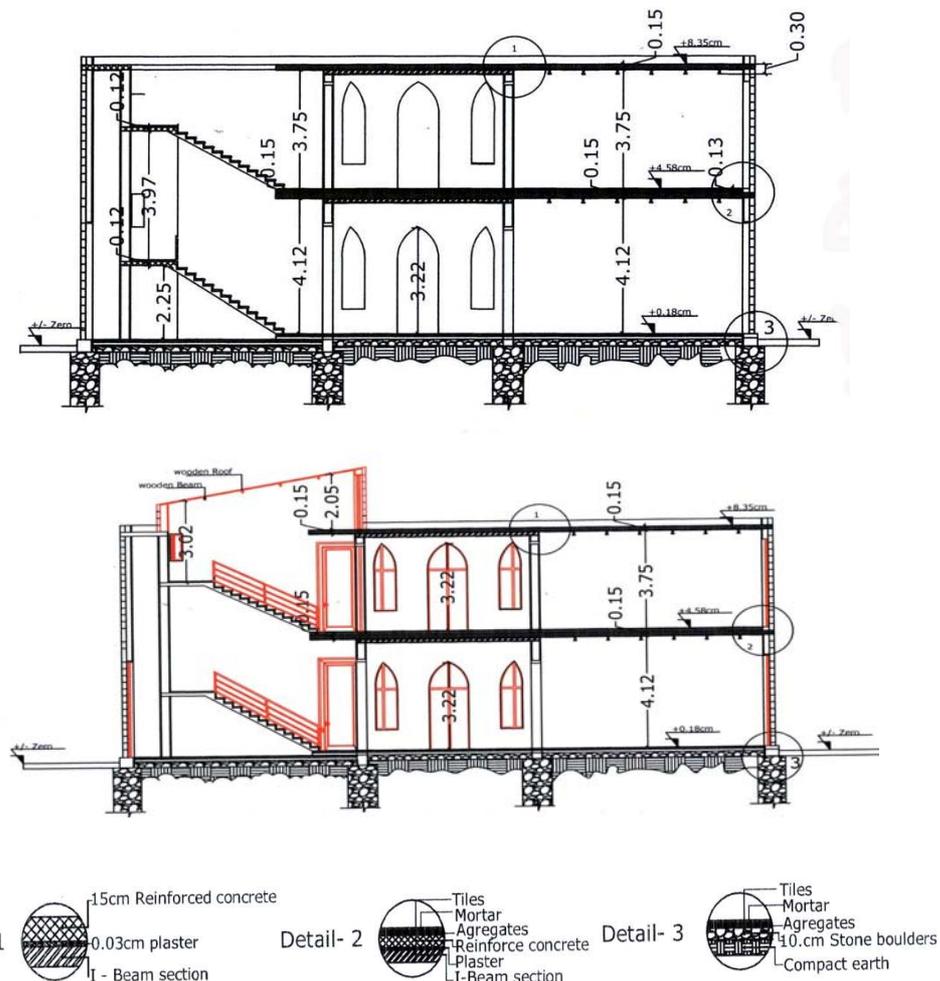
Top: A-A section plan before rehabilitation, below: A-A section plan after rehabilitation.
